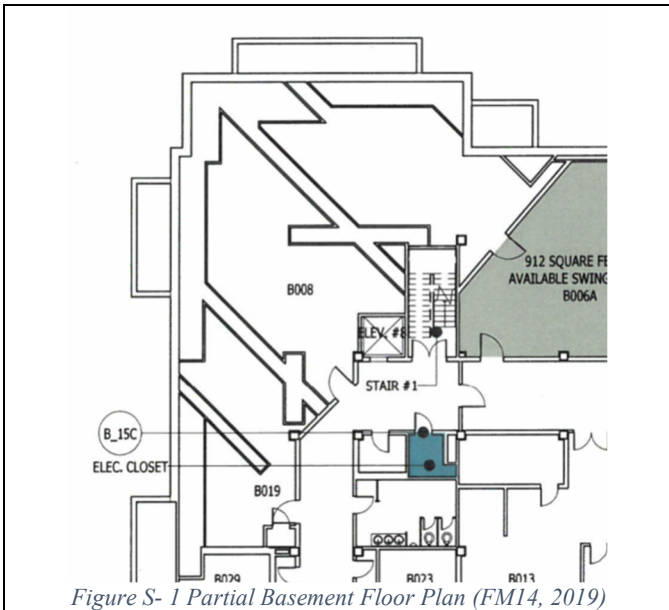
Partial Basement Floor Plan (FM14, 2019)
